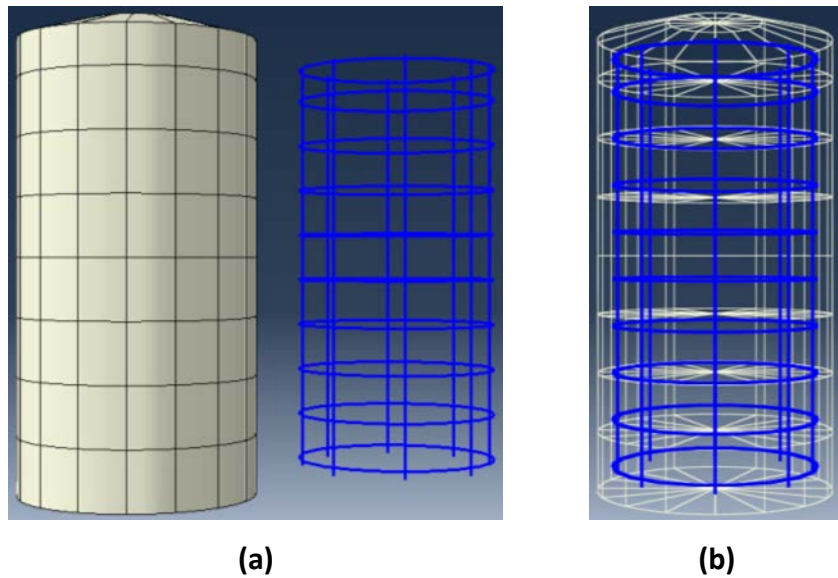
Concrete section in Retrofit Scheme 1: (a) concrete section and reinforcement cage; (b) reinforcement embedded.
